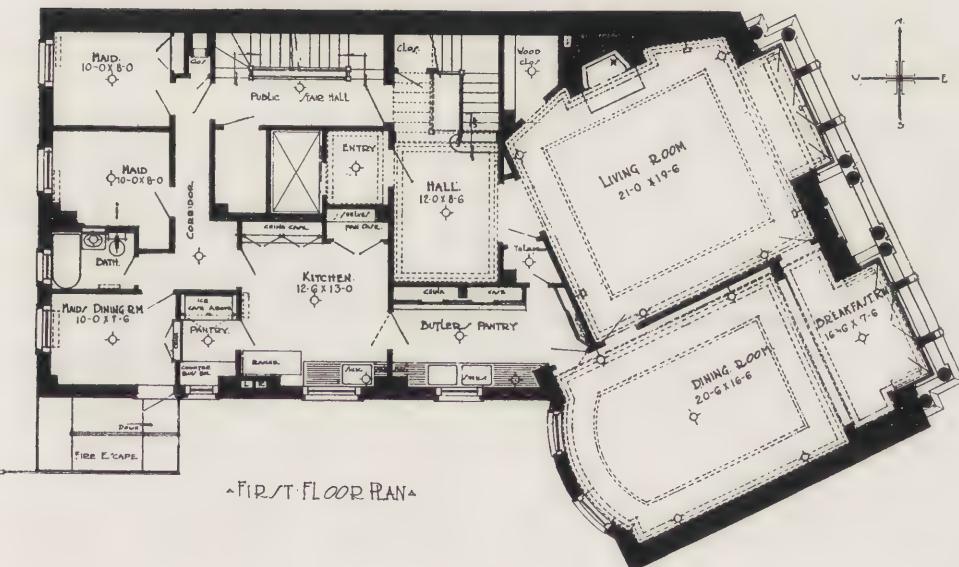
PLAN OF 942 LAKE SHORE DRIVE, CHICAGO, ILL. WILLIAM ERNEST WALKER, ARCHITECT.
